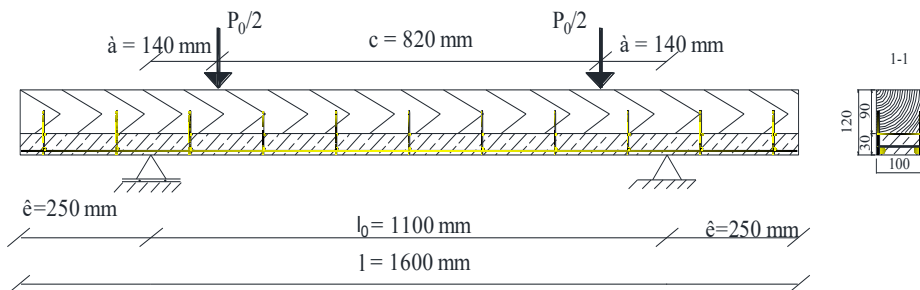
Design scheme of wood-rubcon reinforced composite bridge beams.
